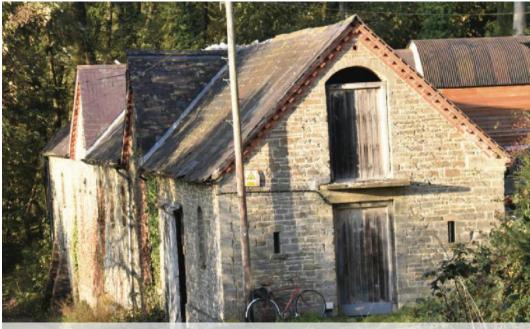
South facing elevation of Barn 1 and part of the west facing elevations of barns 1, 2 and 3
